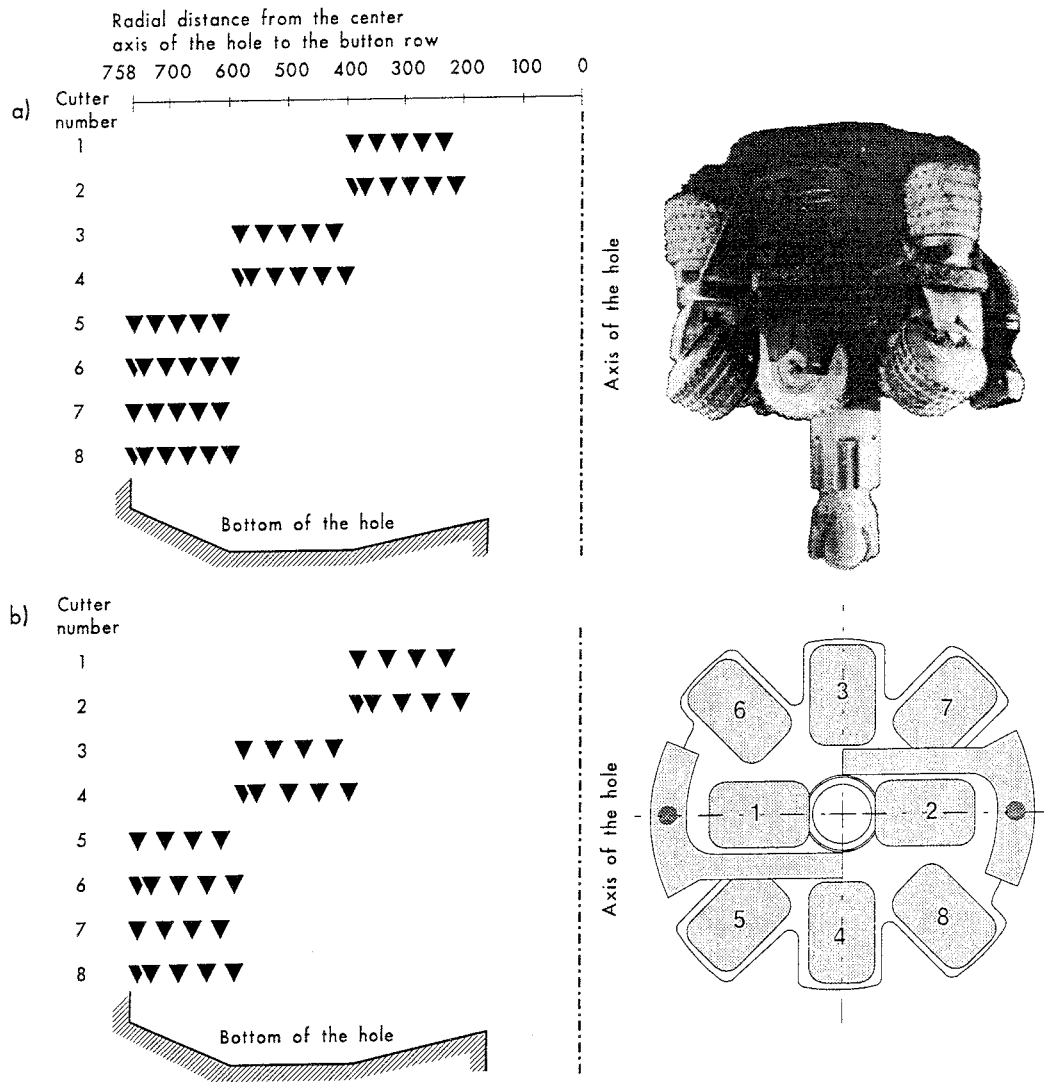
The position of button rows in the cutters. The cutter head is furnished with cutters of type a) CMR-41 & -52, b) CMR-55 & -66.
